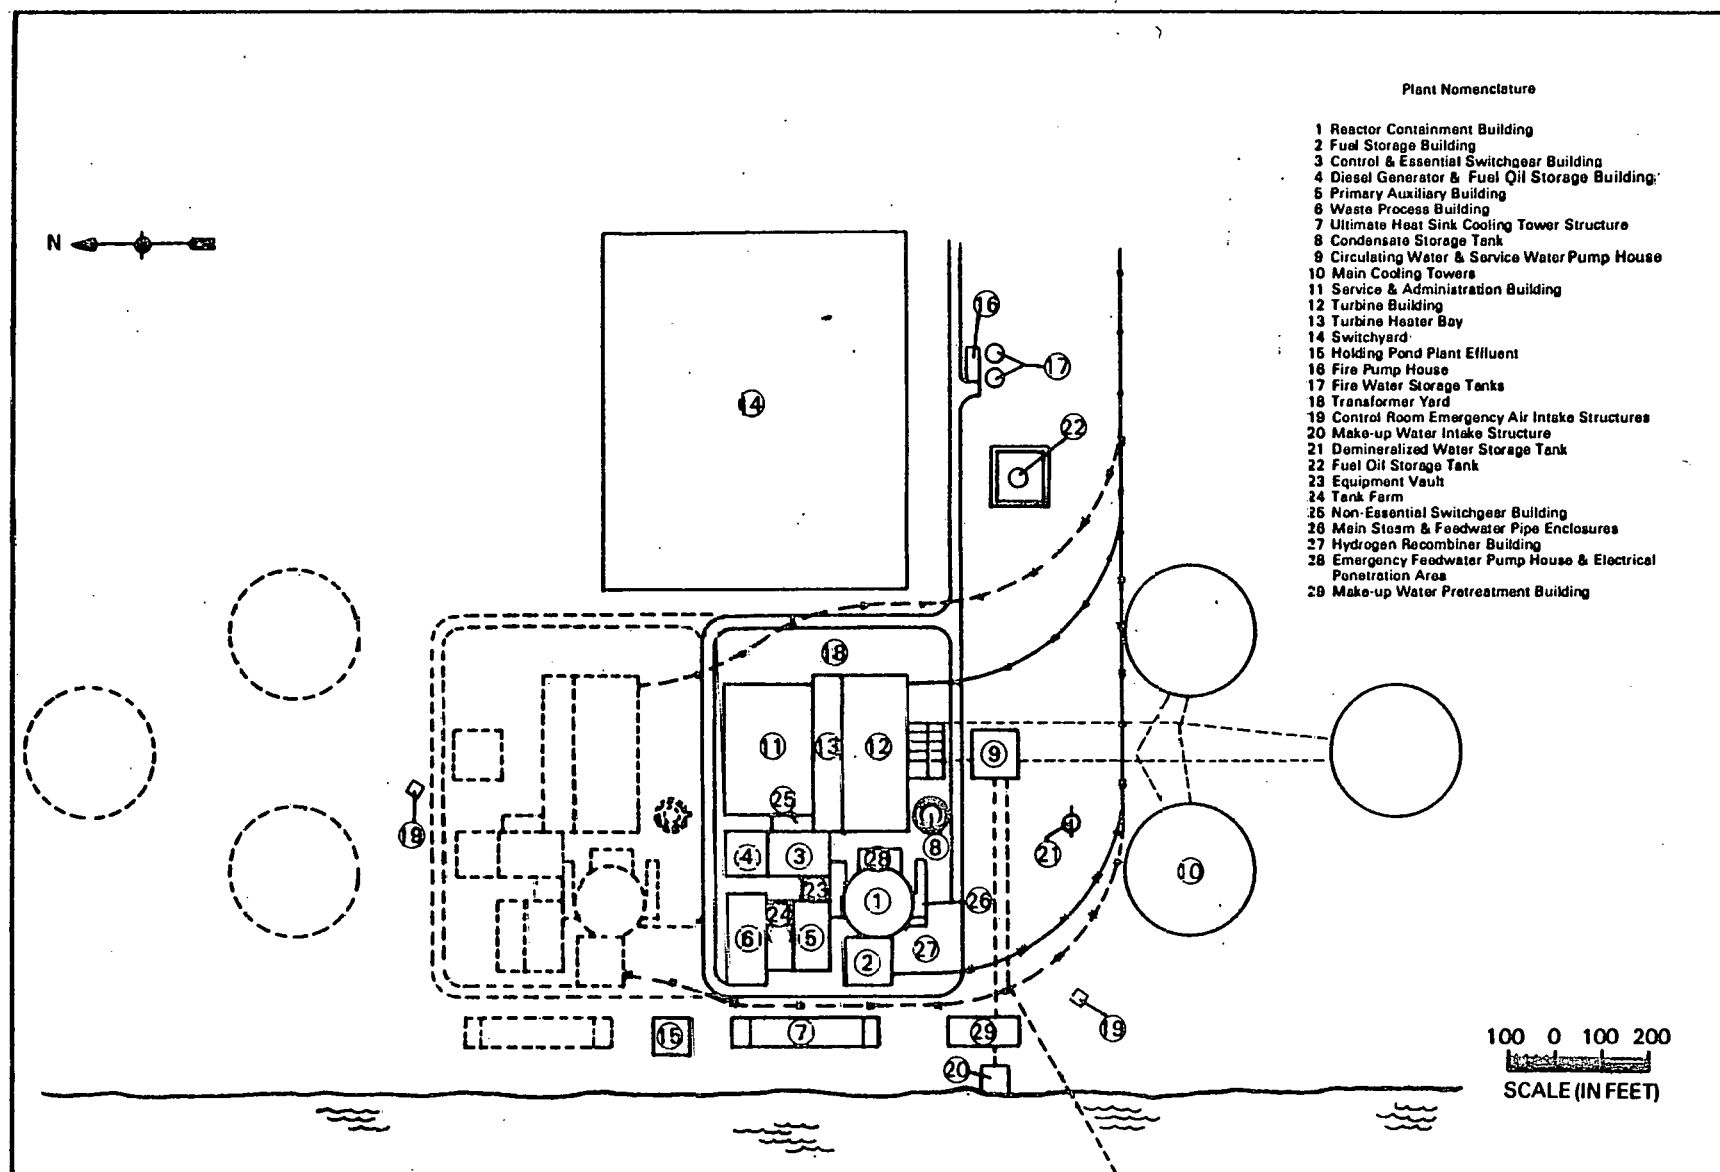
Plot Plan 1250 MWe LWR Facility
